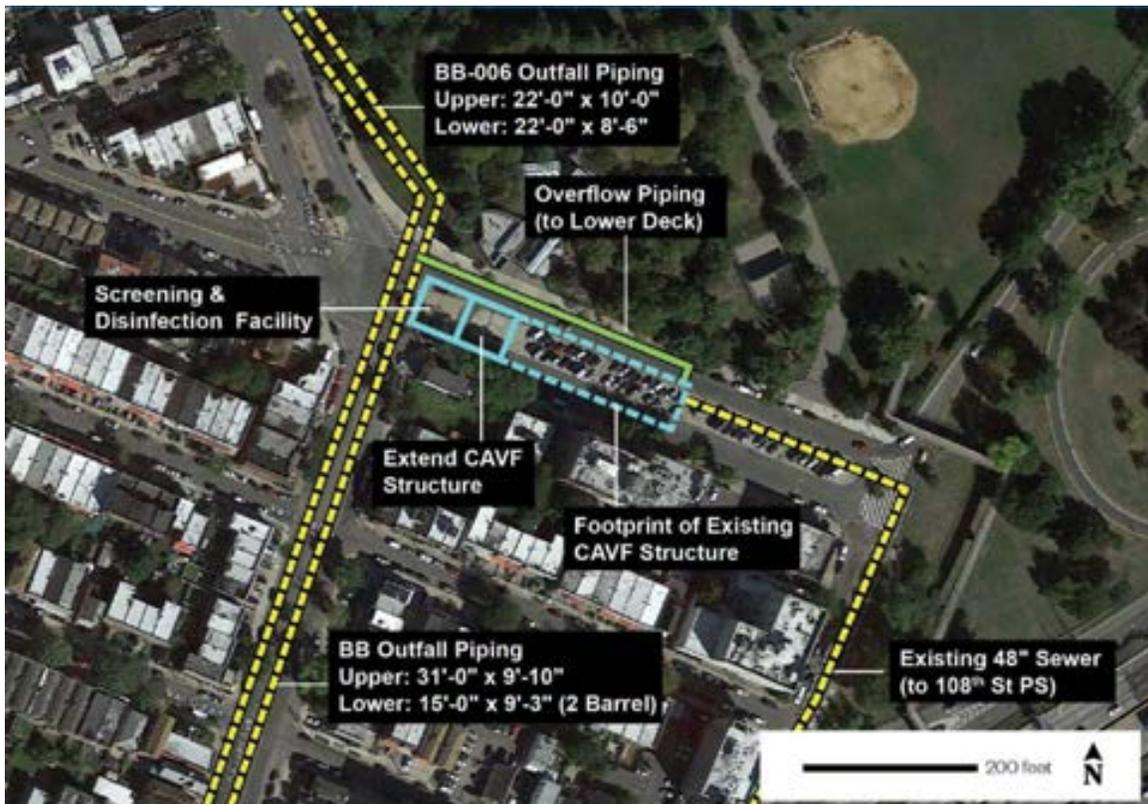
Layout of Alternative 9-2 – Re-purpose the CAVF as a Retention Treatment Basin
